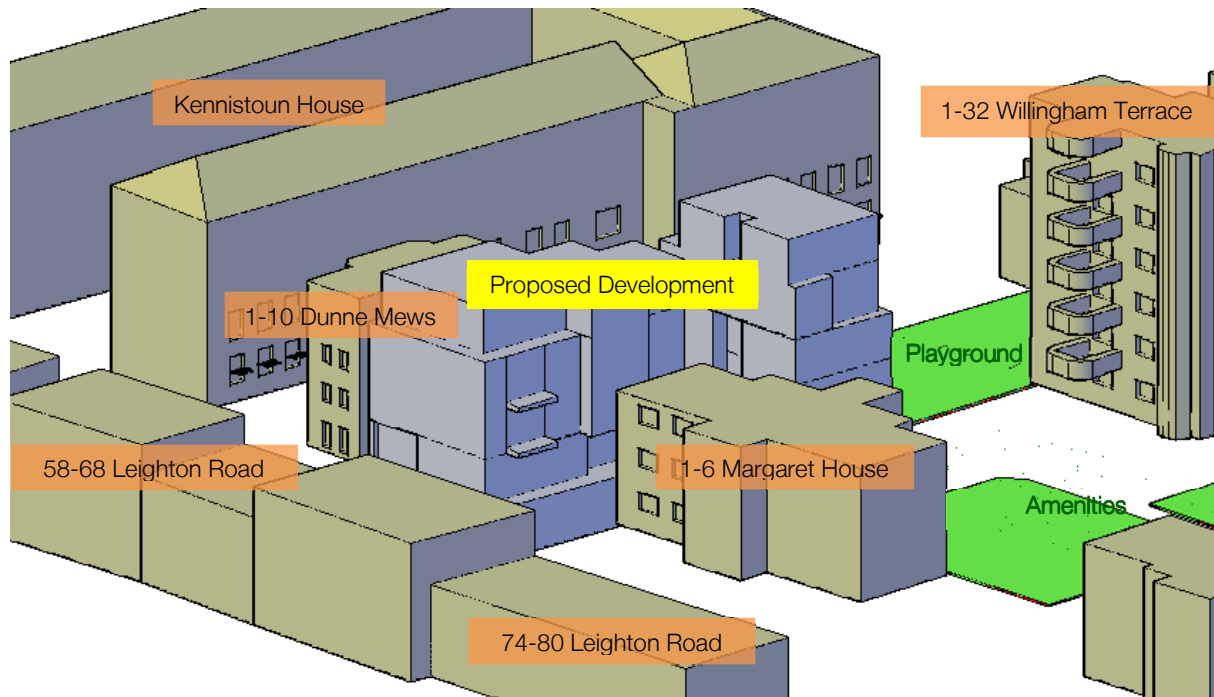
Model of the Proposed building on site and surrounding buildings
